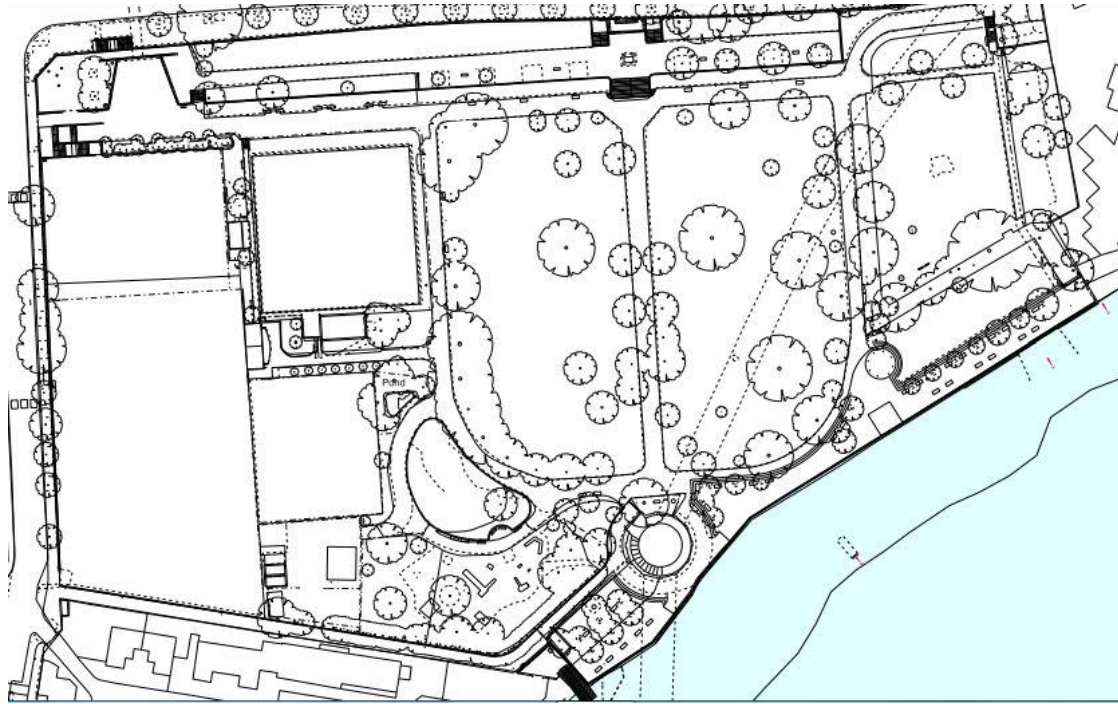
Plan of King Edward VII Park, Shadwell, Tower Hamlets. The Tideway Project children's playground is in the semi-circular area lower left centre. Source: KEMP Shadwell Master Plan pdf.
